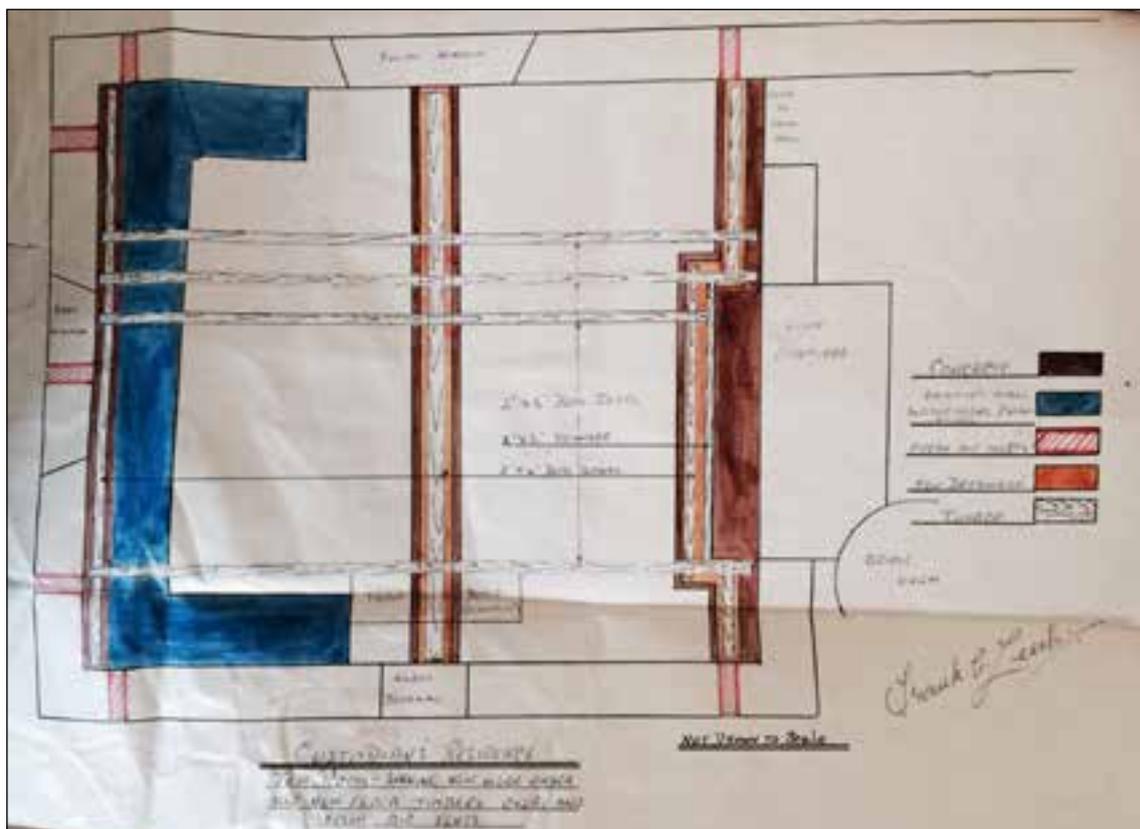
Drawing of the floor of the Tea Room in the Red House (or 'Custodian's House'), 23 September 1955. The blue area represents footings of an earlier building, exposed during excavation. The white, orange and brown areas show new work being undertaken. (EH Registry File AM046227/004)
